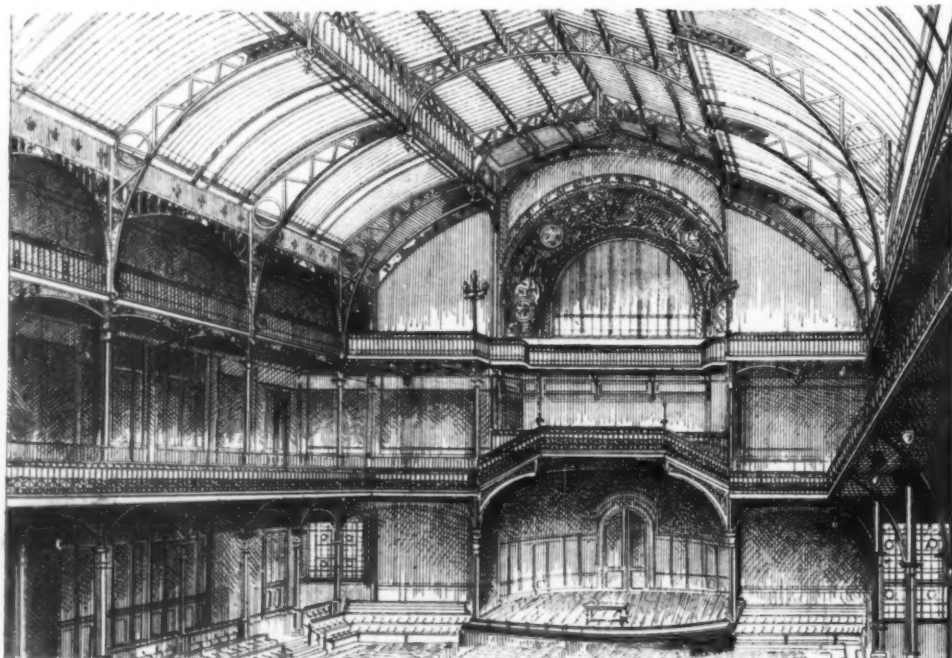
INTERIOR VIEW OF THE CONCERT HALL.
